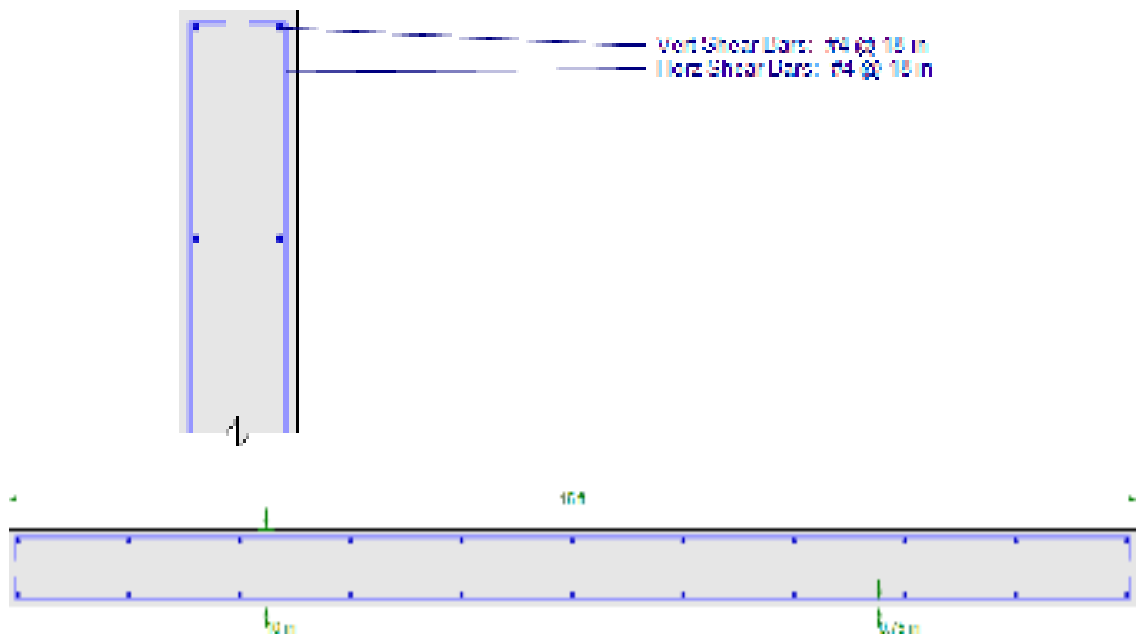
Building (B11-12S-L-S) Special RC Shear Reinforcement Details; Wall Section for Floors 10-12
